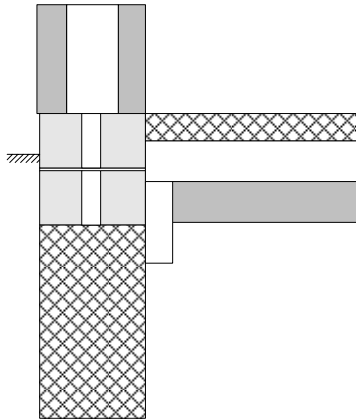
Section of a joint between the outer wall/foundation/slab-on-ground with vertical insulation inside of the foundation
